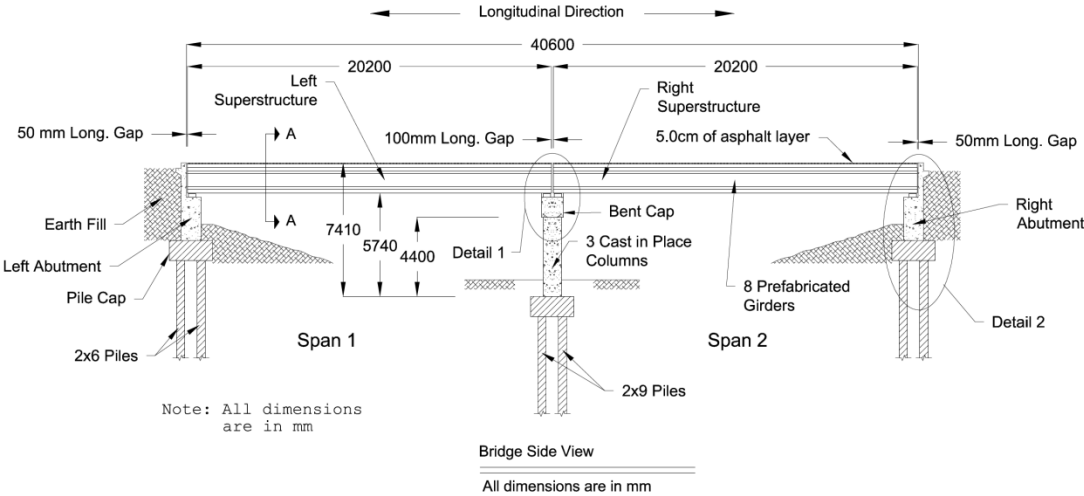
Longitudinal view of Elek Deresi Bridge.
